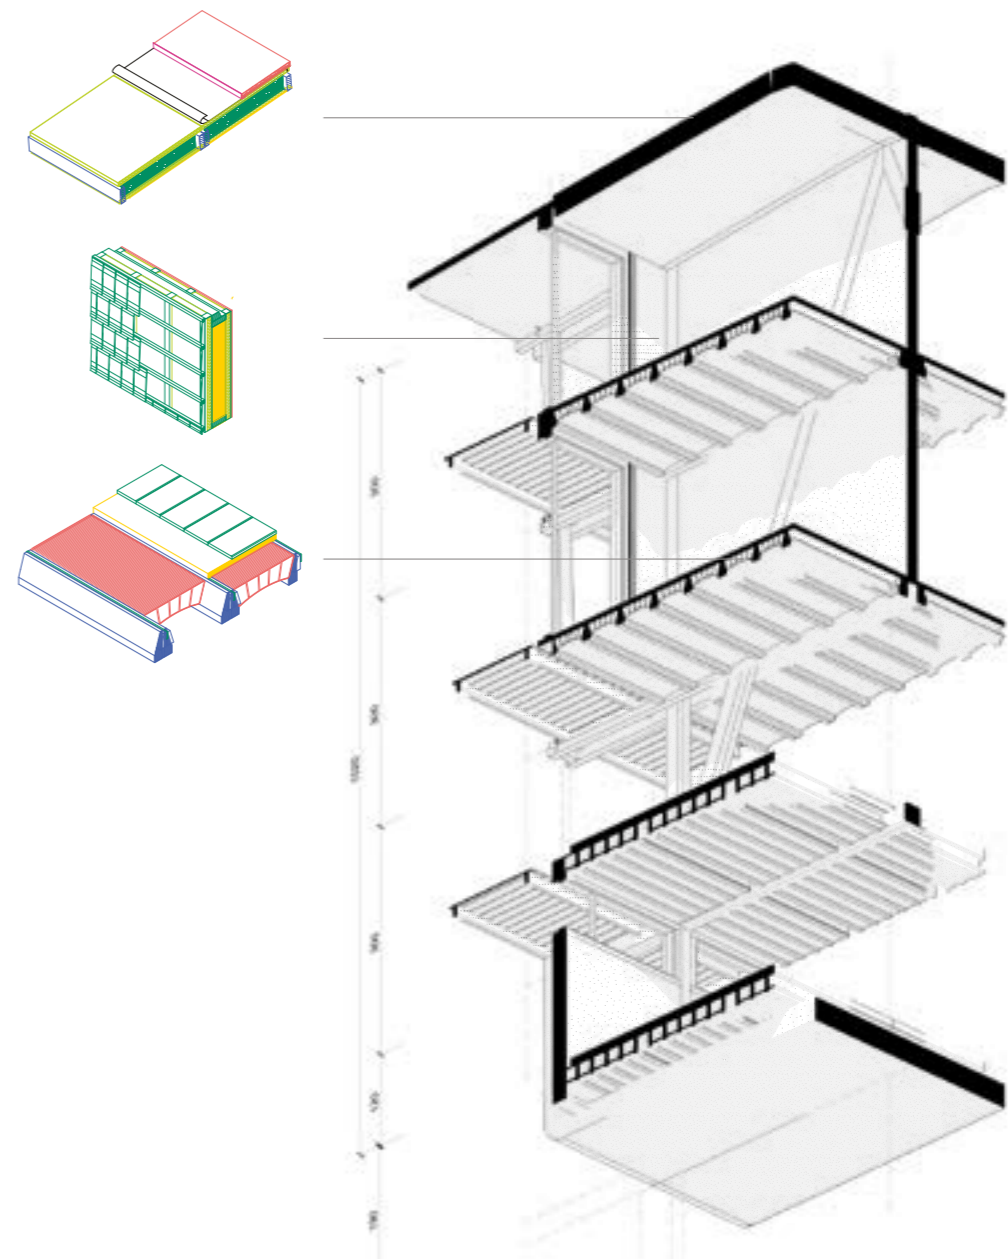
Choisy projection of building system, with roof, wall and floor components highlighted (own work)
